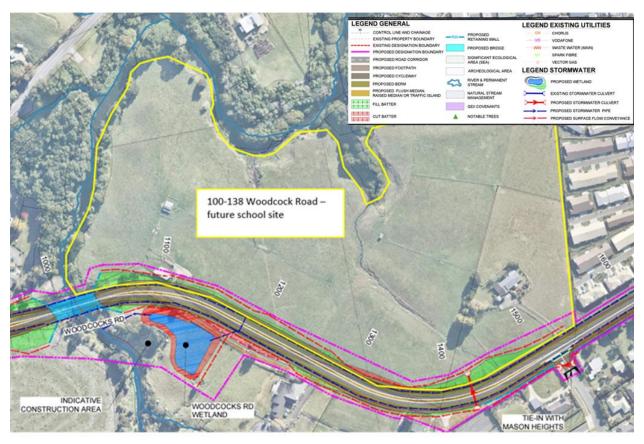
Proposed works in proximity to the Ministry's site at 100-138 Woodcocks Road (Future school site is outlined in yellow)
